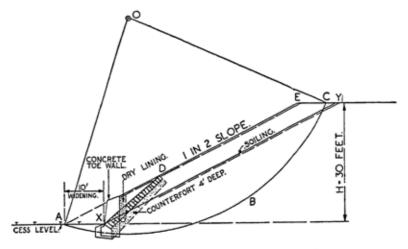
Toe Wall and Stone-pitched Slope. (Problem 41.)
